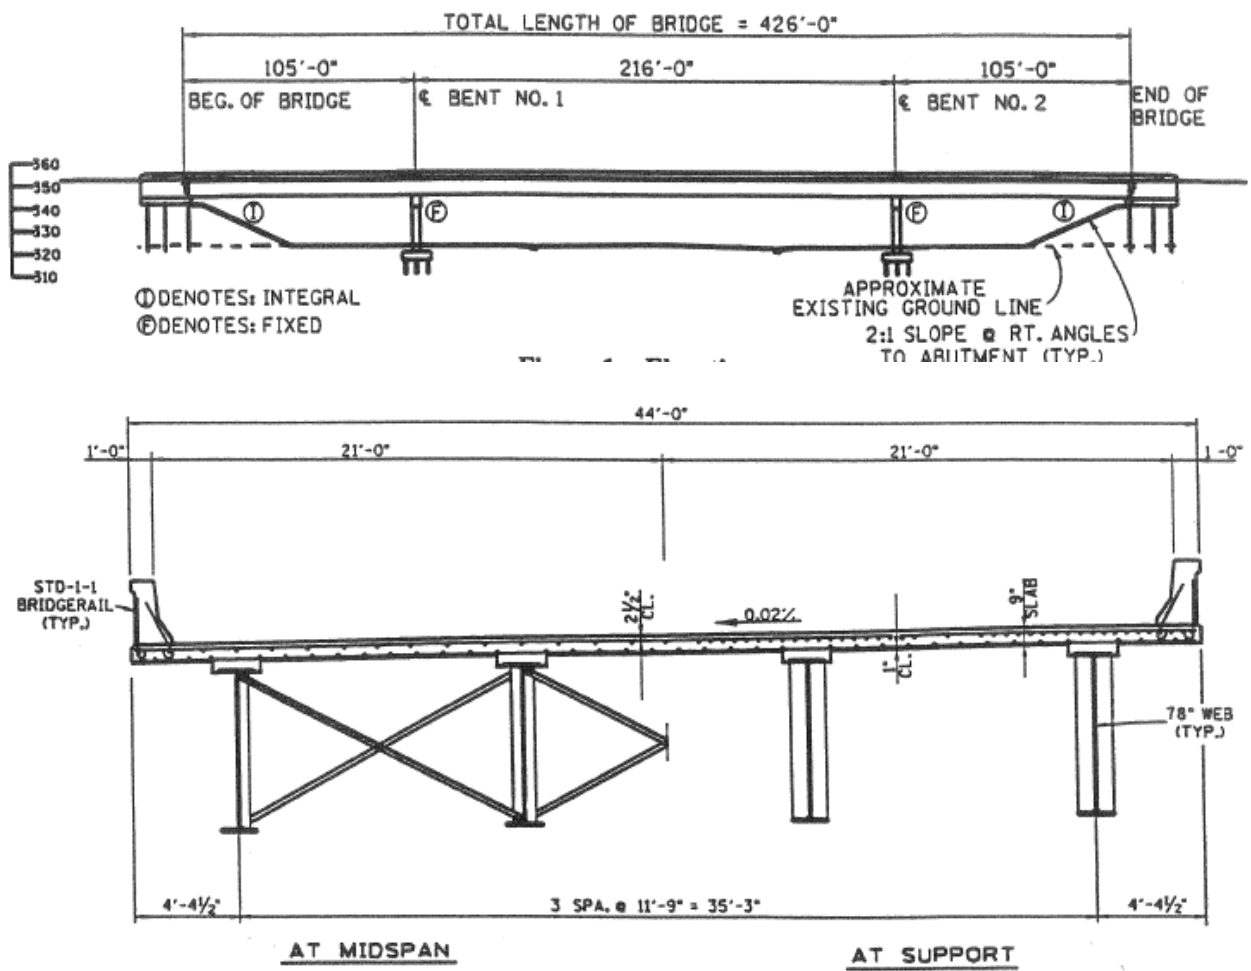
Elevation and cross-sectional view of the bridge (Wasserman and Walker 1996)
